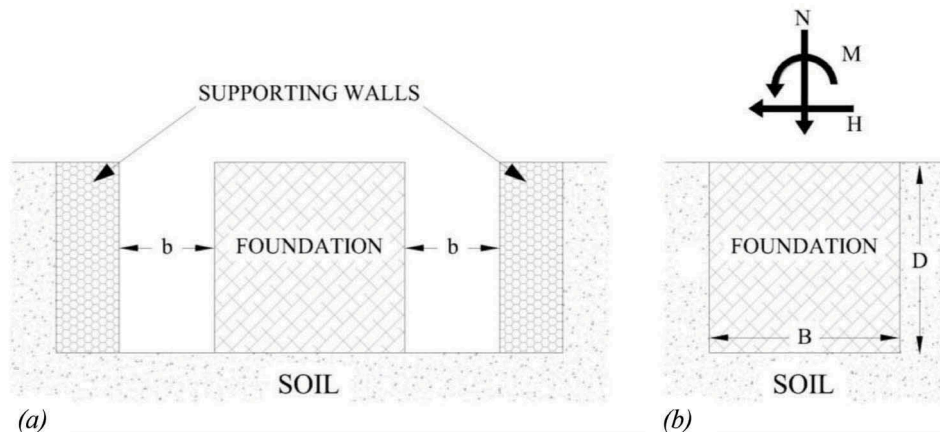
a) Disconnected foundation; b) Connected foundation and acting forces
